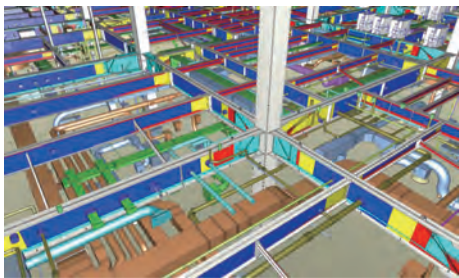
Fixing of ceiling inside equipment and coordination of steel-frame sleeves
